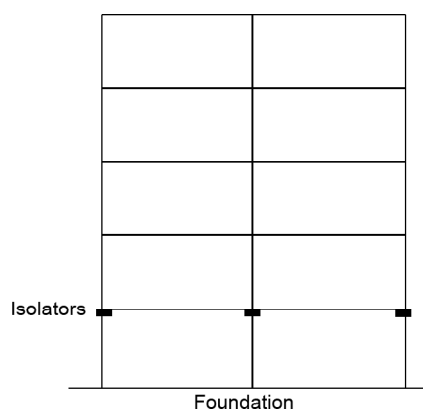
Bearings on top of ground-floor columns in base-isolated building.
